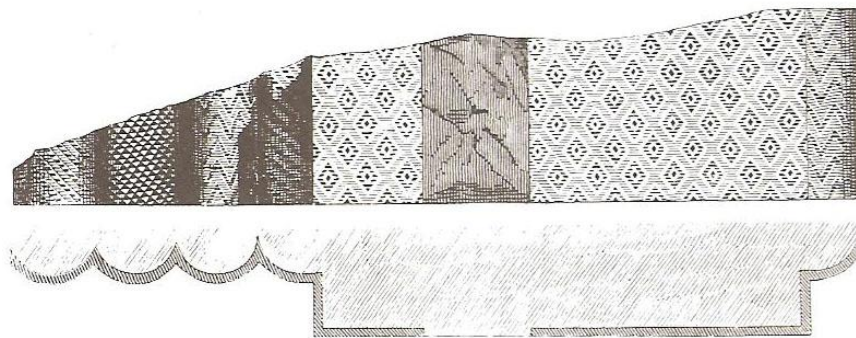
Plan and Elevation of an Assyrian Mosaic Wall
